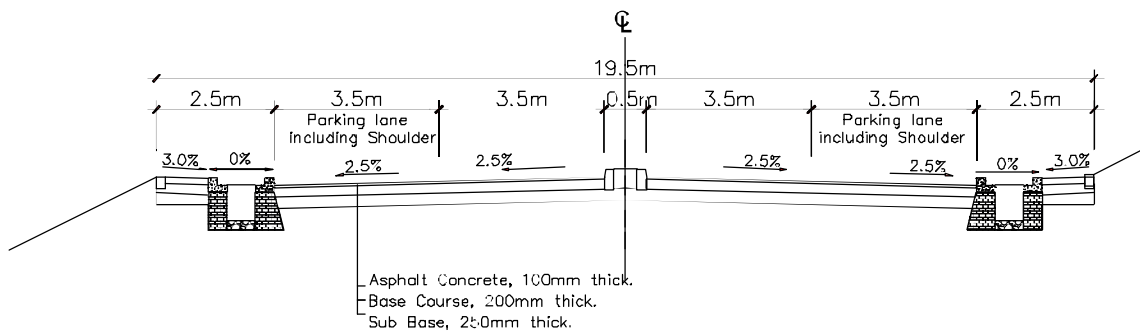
Proposed Typical Cross Section (D/Markos Town Center Section)
